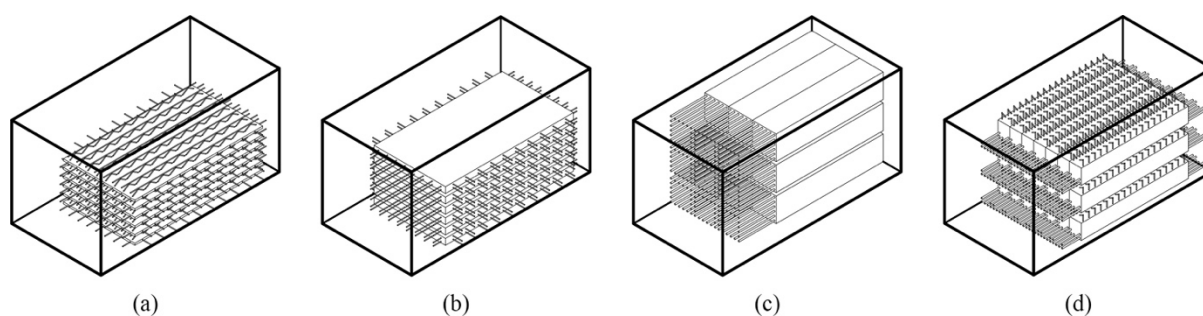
Packing status of prefabricated floors (a), walls (b), columns (c), and beams (d)
